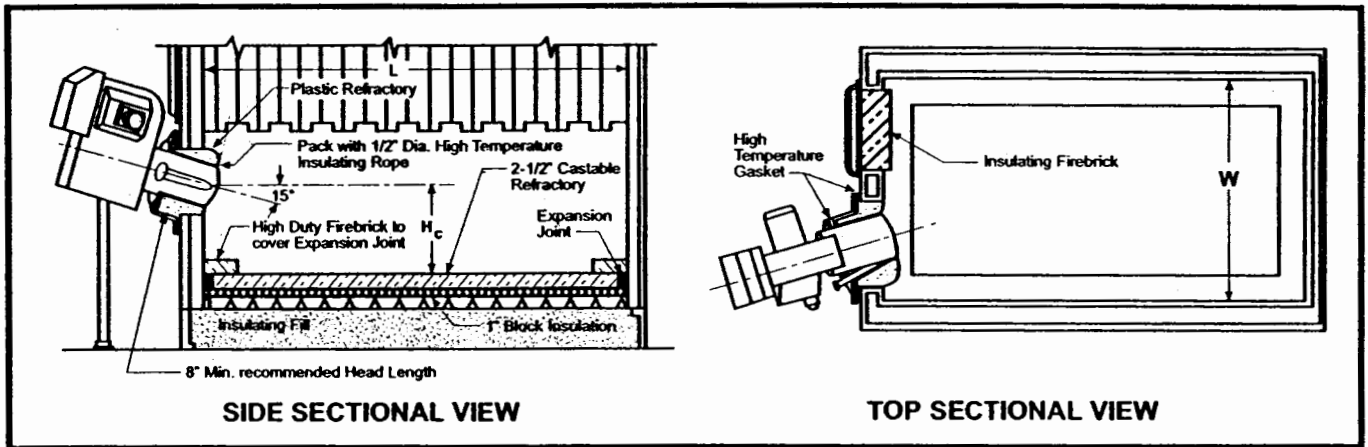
Type "R" Burner Installation Firing Cast Iron Boiler with Double Doors
